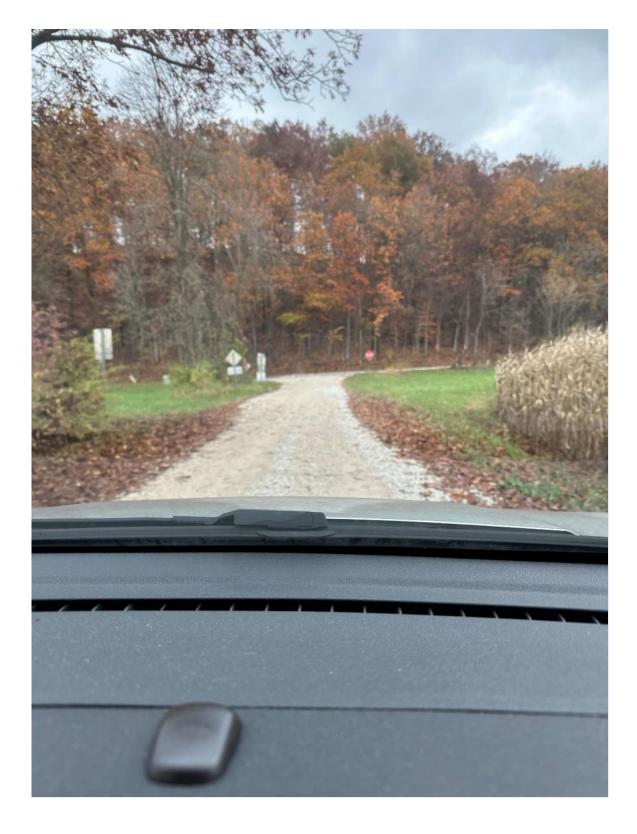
North-facing view of the intersection of N Maple Grove Road and N Bottom Road
